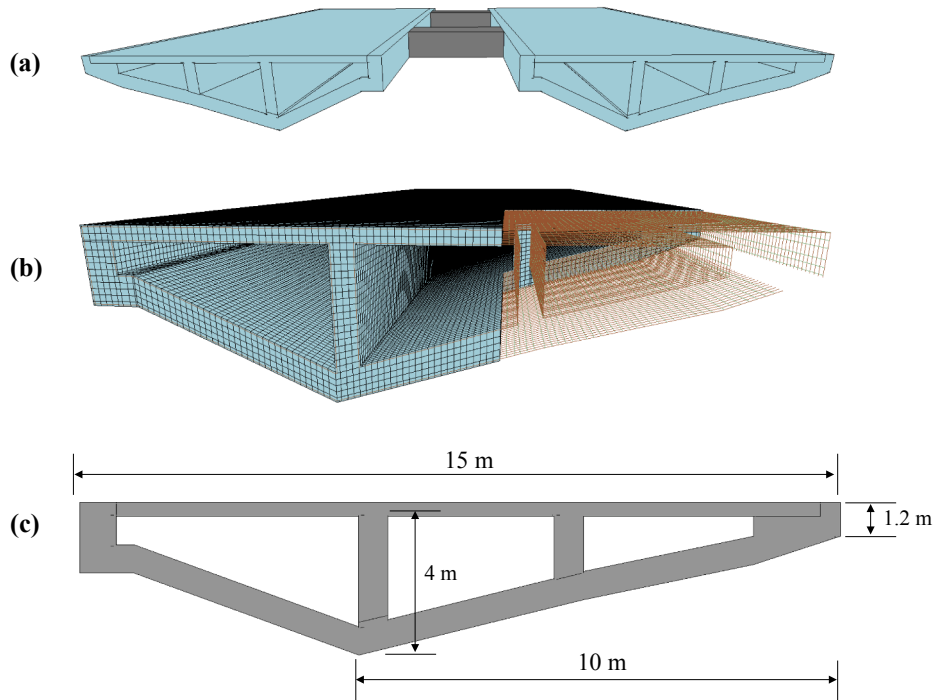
FE model of the reinforced concrete bridge girder (Girder 3).
